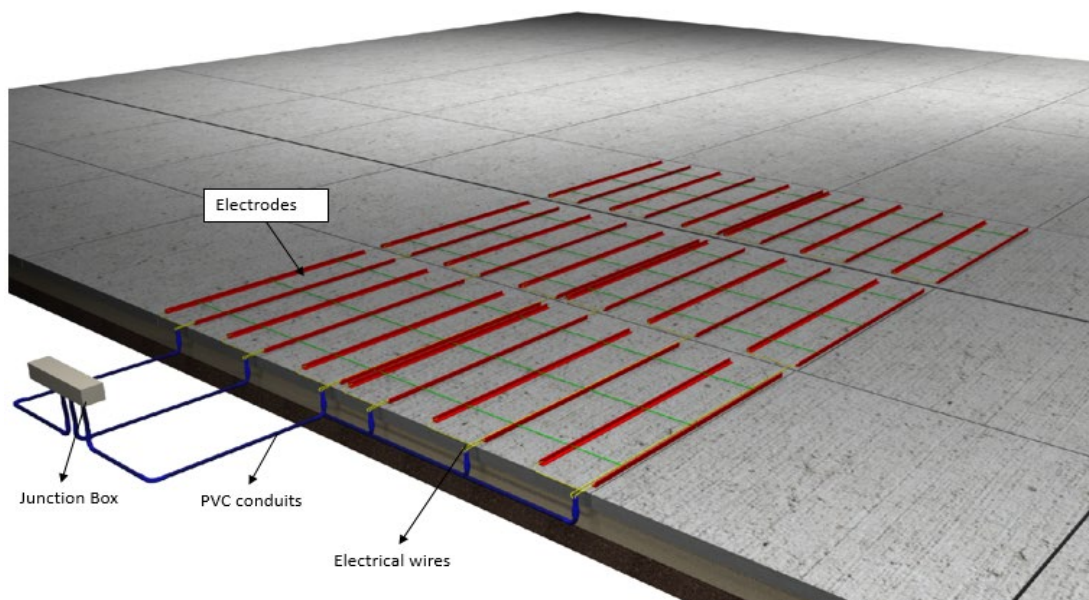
Electrode Placement and Electrical Wire Connections for a Bonded System
